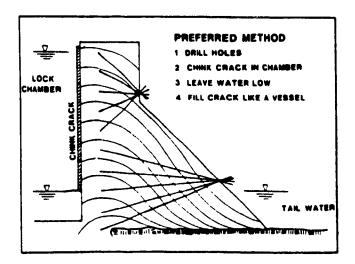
GROUTING CRACKS IN LOCK MONOLITHS AT LOWER MONUMENTAL LOCK AND DAM<sup>28</sup>
